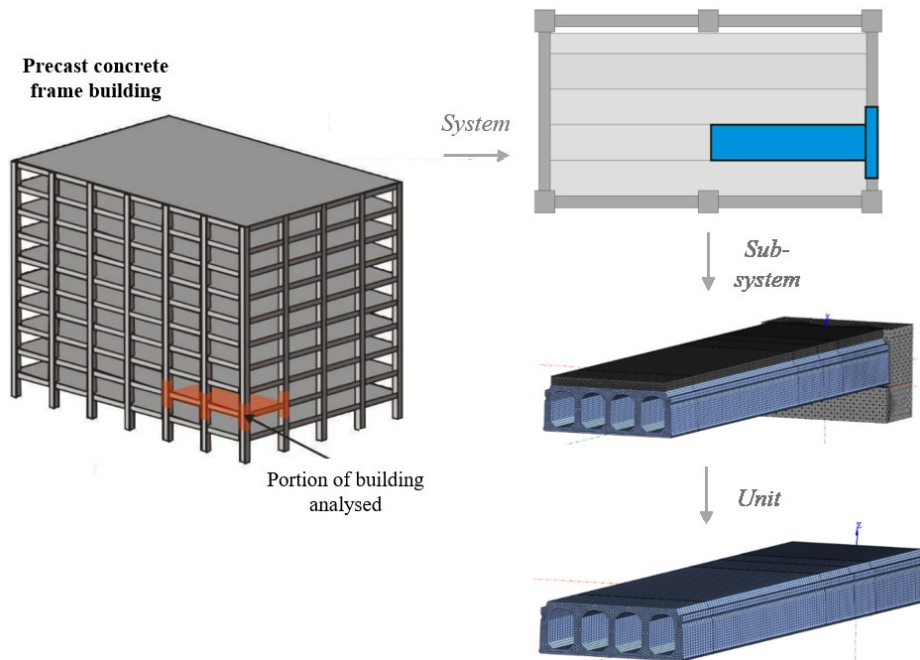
Framework for the FE modelling campaign proposed for PPHC floors.
